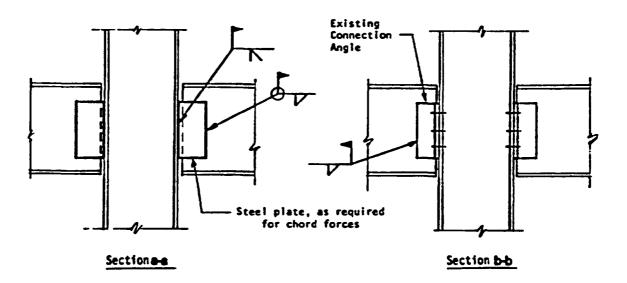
Modification of existing steel framing for diaphragm chord forces
